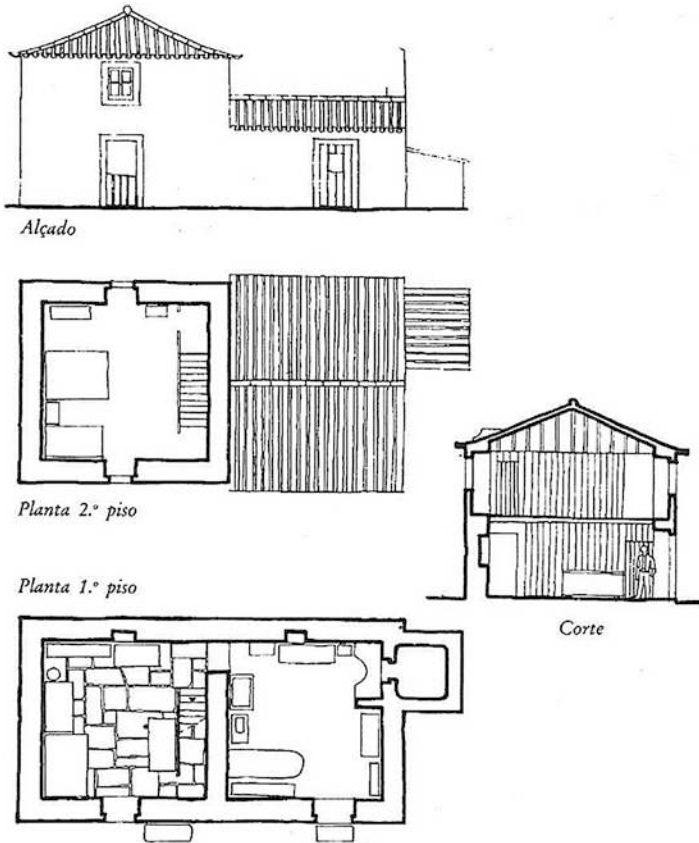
“Salioio” house—plans, elevation, and section (AAP 1961)
